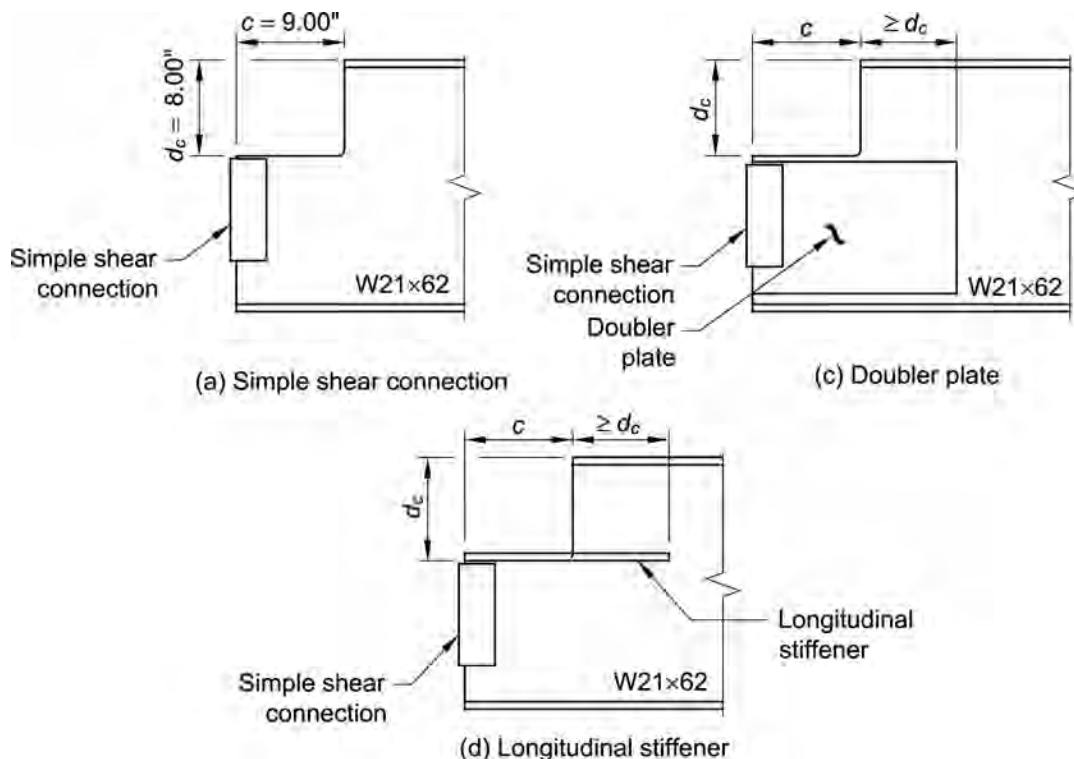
Connection geometry for Example IIA-6.
